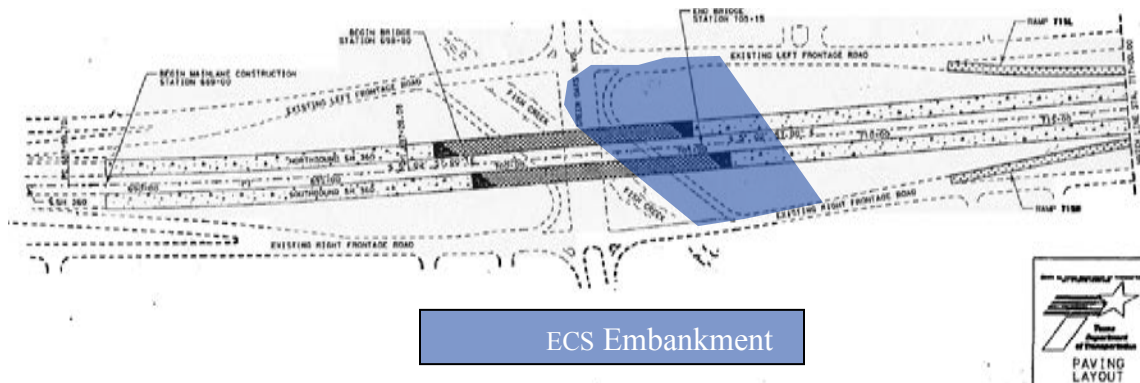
Details of ECS Bridge Site, SH 360, Arlington, TX.
